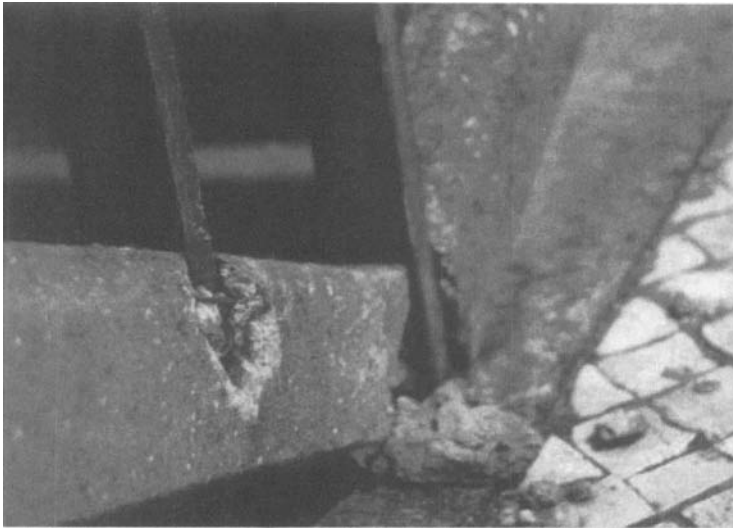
Deterioration of handrails in a Lisbon viaduct, Portugal
